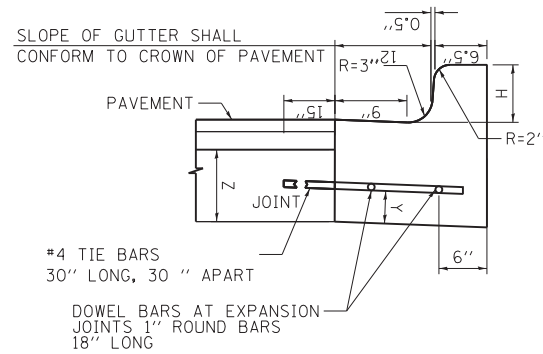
DETAILS OF CONCRETE CURB, TYPE B AND COMBINATION CONCRETE CURB AND GUTTER, TYPE B (SPECIAL)
